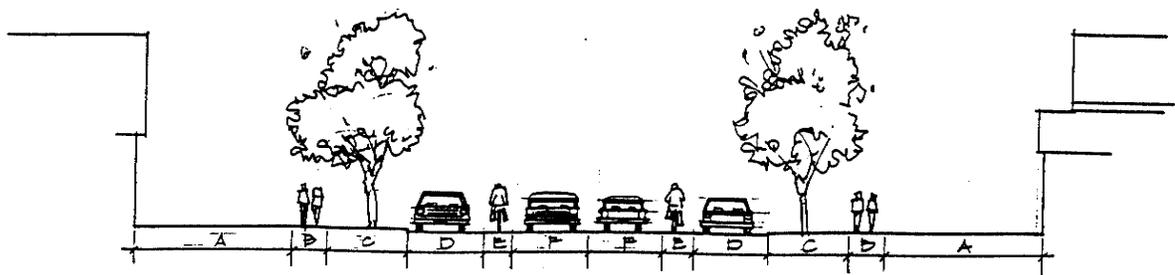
Schematic sketch of a typical collector street cross-section. Table 1 lists the recommended dimensions of each component: A) building setback from street right-of-way; B) walkway; C) planting area; D) parking lane; E) bicycle lane; F) travel lane.
